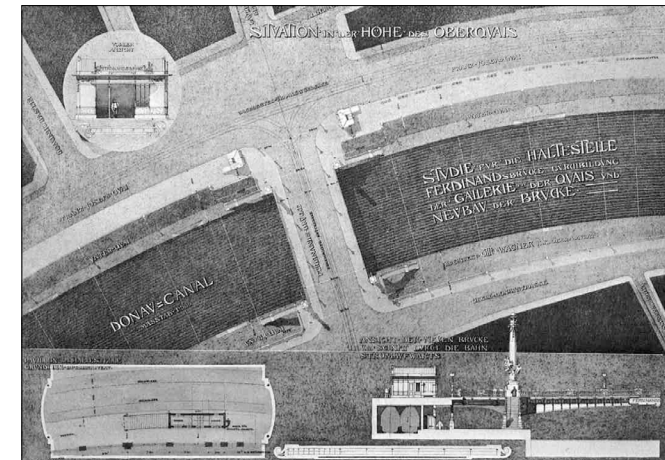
/ Ferdinand's Bridge - Situation and Section , Railway Level
